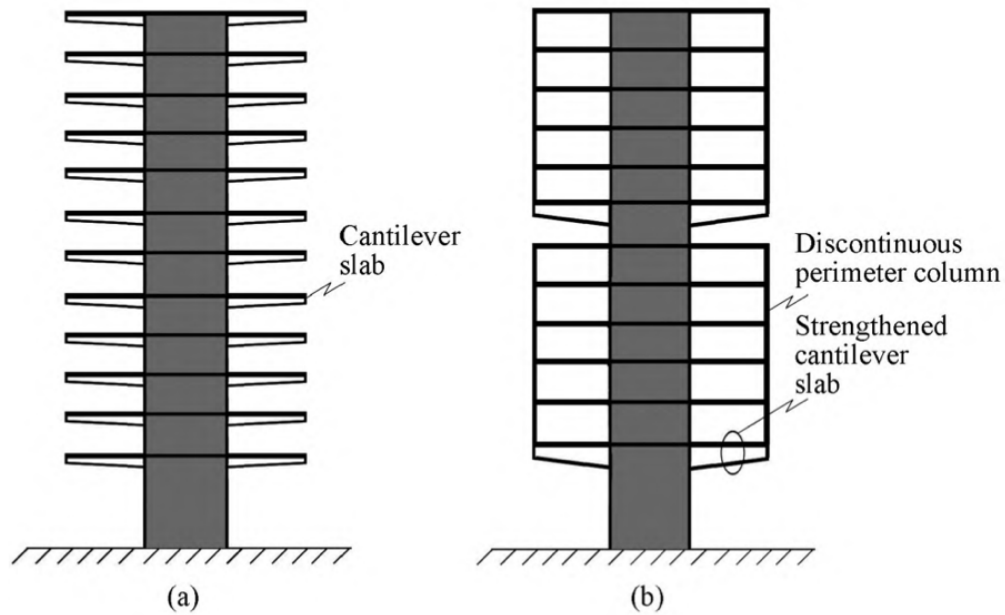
Core systems: (a) with cantilevered slabs, (b) with external discontinuous columns
